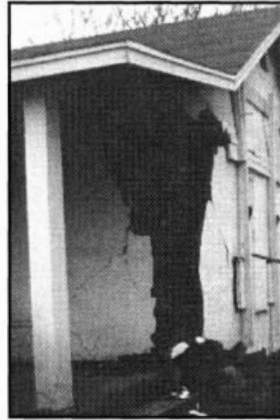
Sepulveda Adobe. Vertical cracks at this corner lead to collapse of the corner section.
